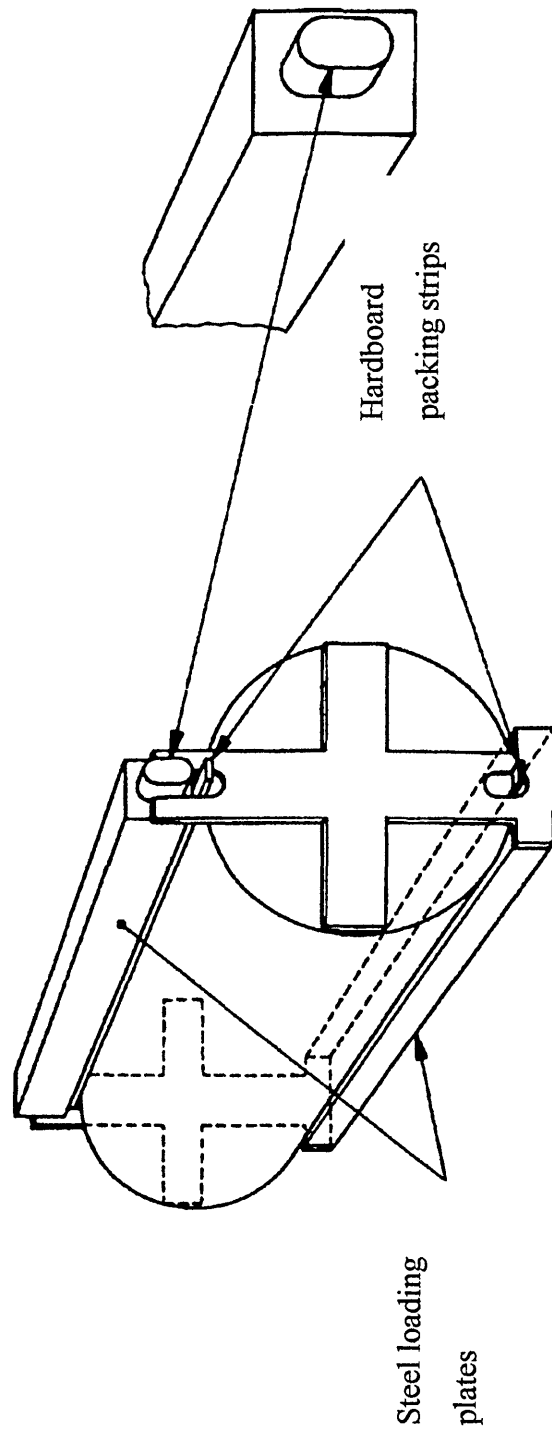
Arrangement of loading of tensile splitting test specimen
